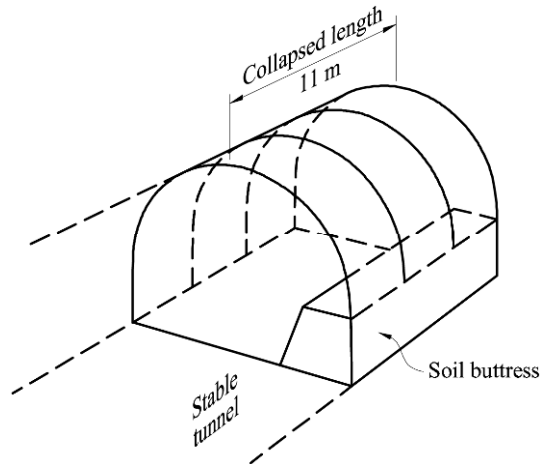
Stable tunnel and failed section. Vault was continuous throughout.
